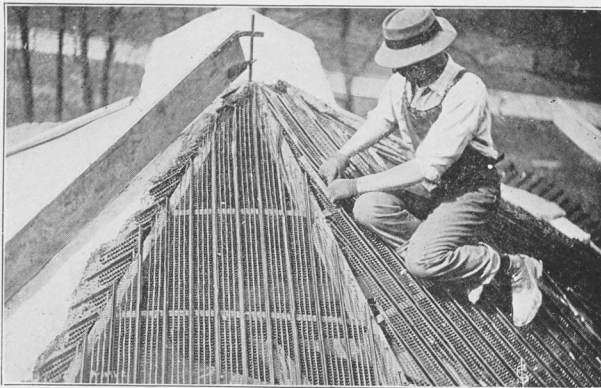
Putting Expanded Metal on False Work for Concrete Roof.
